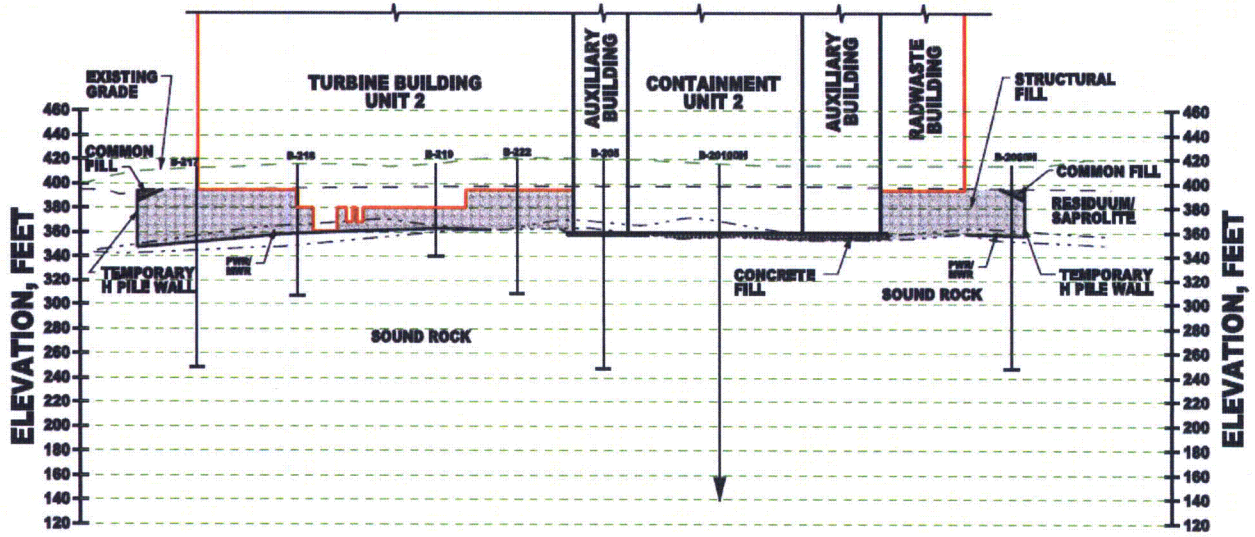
Cross-Section of Structure Foundation A-A
